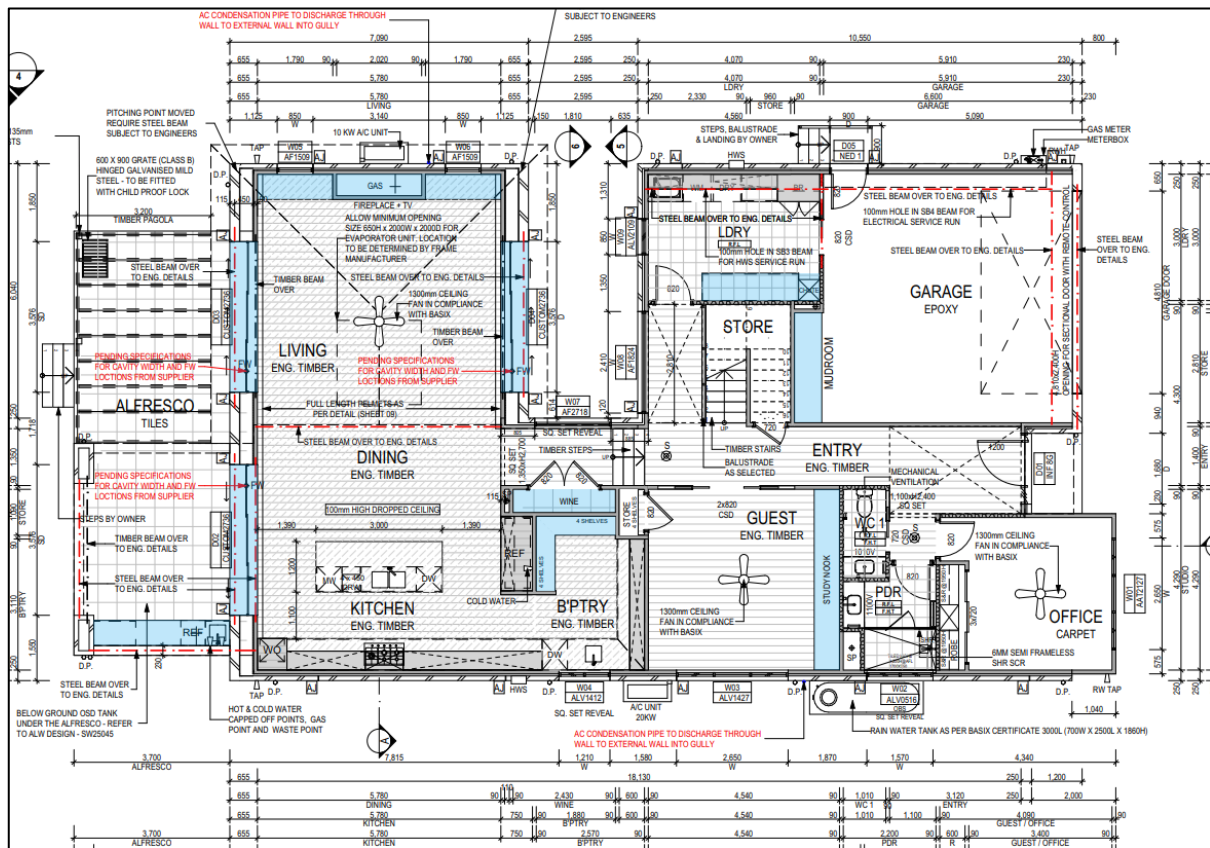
Proposed Ground Floor Plan (source: Hall and Hart, Rev G)
